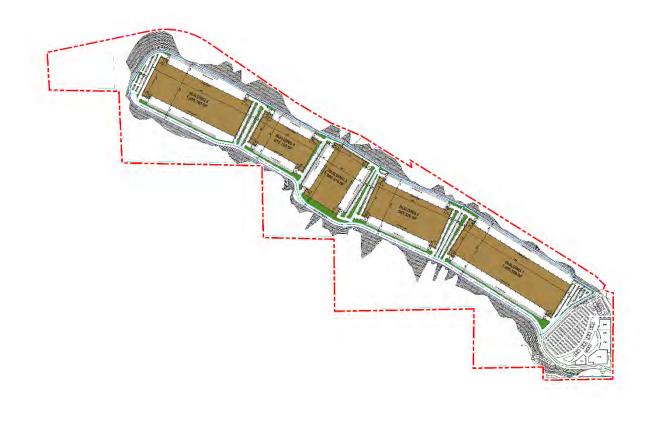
B: CONCEPTUAL SITE PLAN
